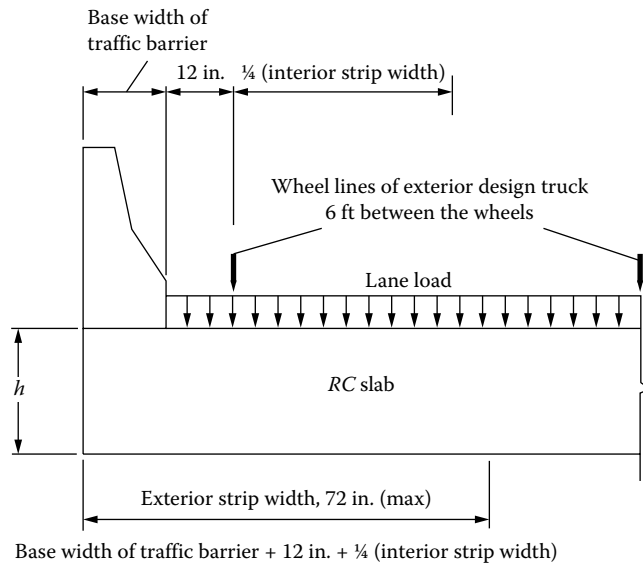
Width of the exterior strip of a slab-type bridge.
